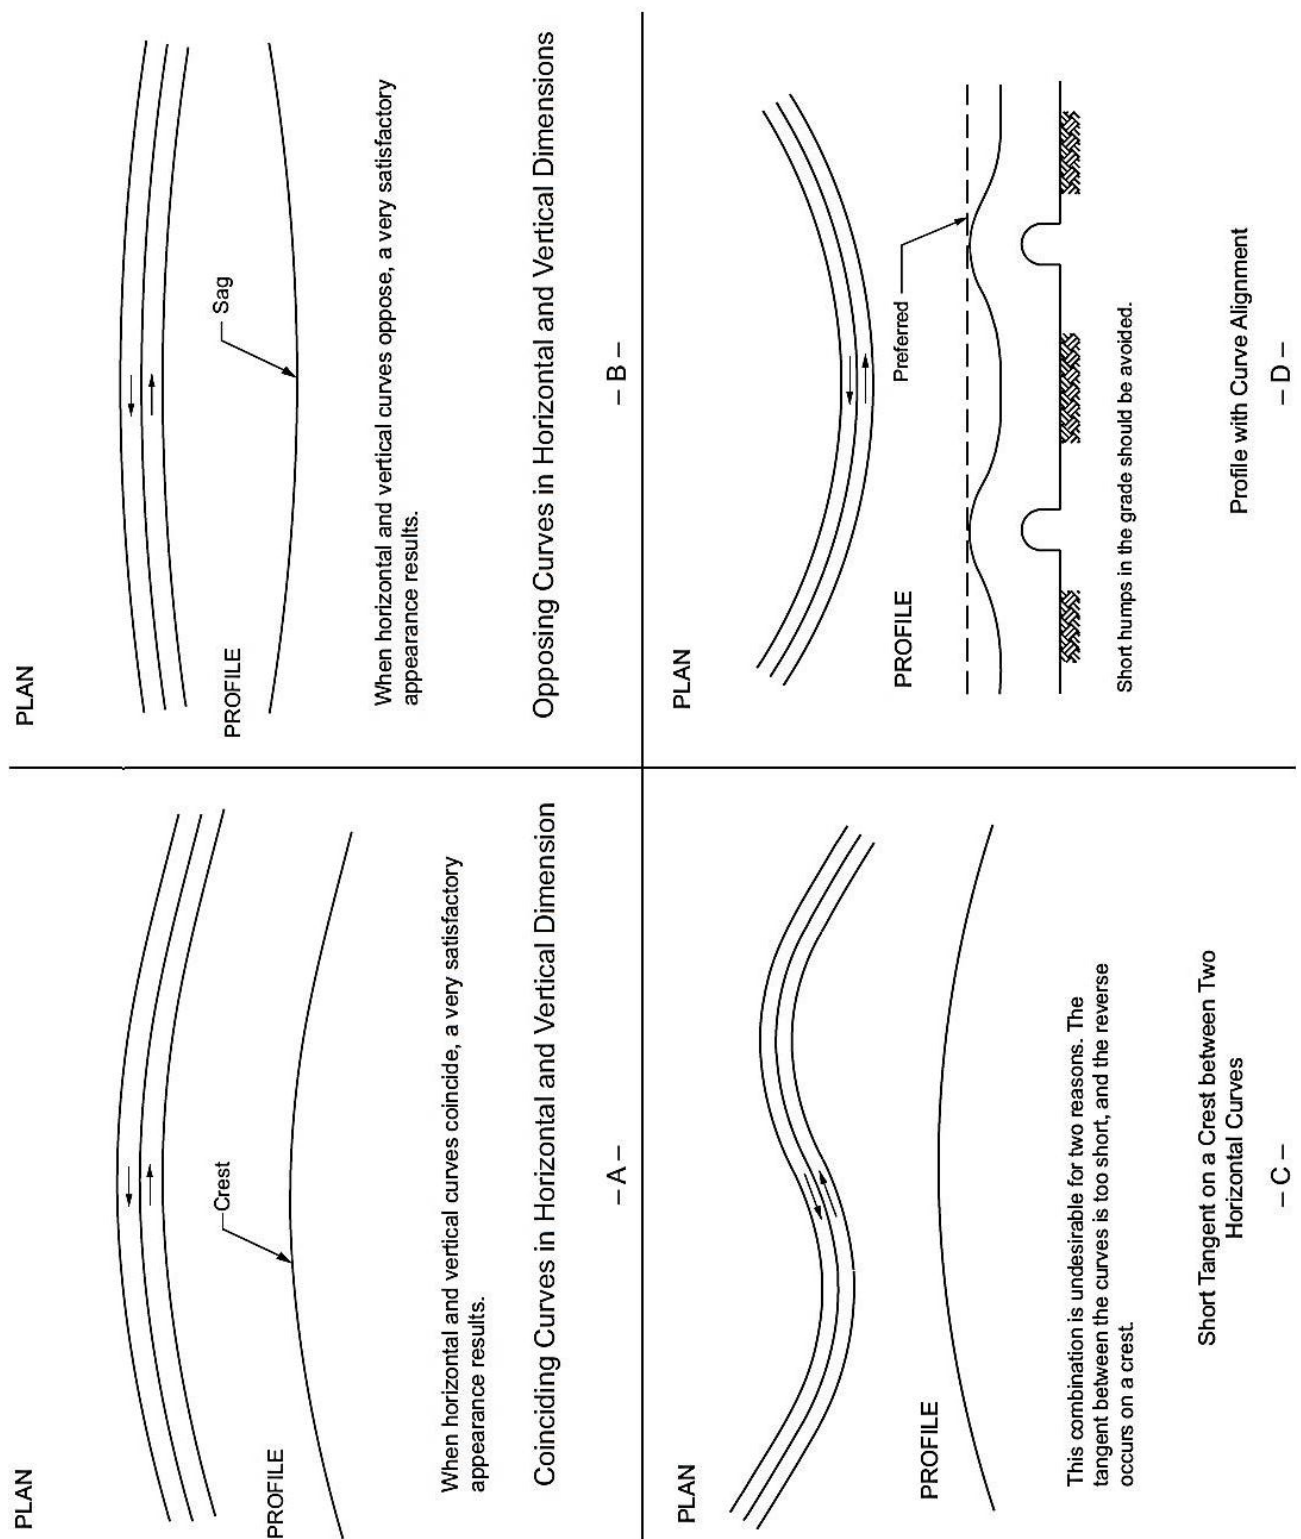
/1: Alignment and Profile Relationships in Roadway Design [1, p.3-168]
